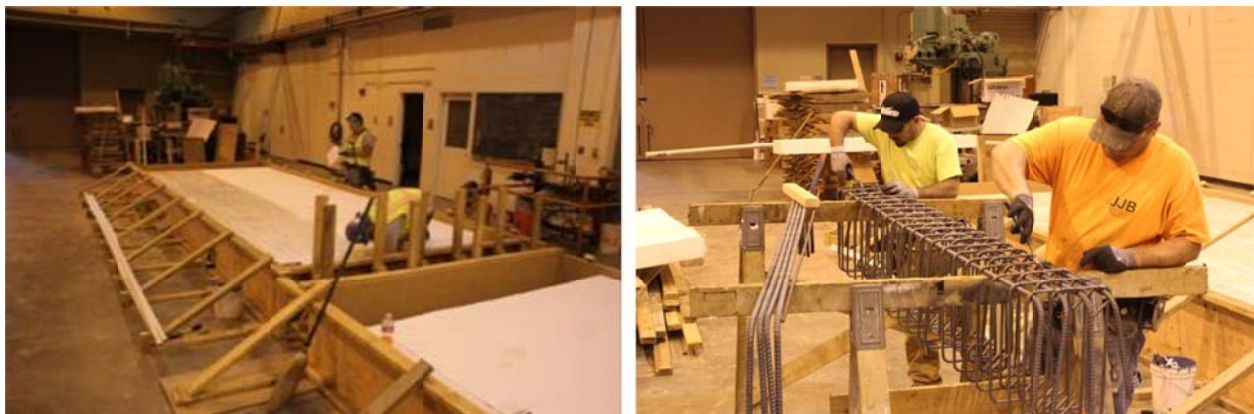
Preparing styrofoam blocks used to fill the void between seat beams then covering it with plastic surface (left); fabricating the reinforcement cage of the seat beams (right)
